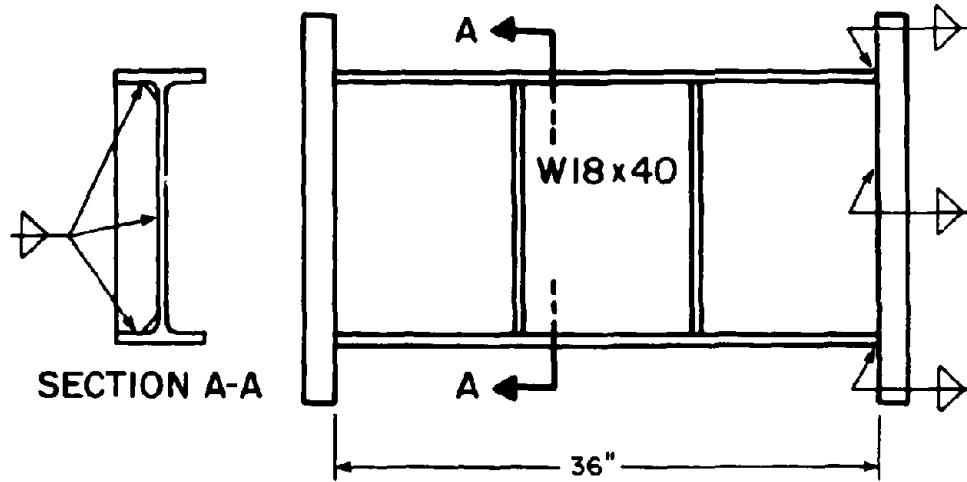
Typical Section and Connection Details of the Specimens.
